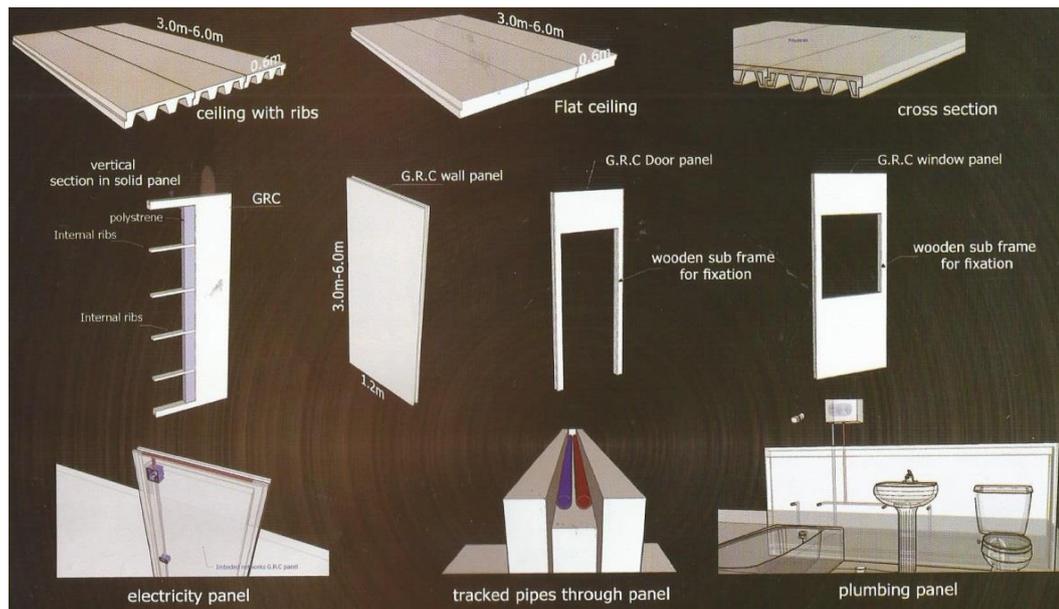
GRC Component Details (Arabian Construction House, 2016)
